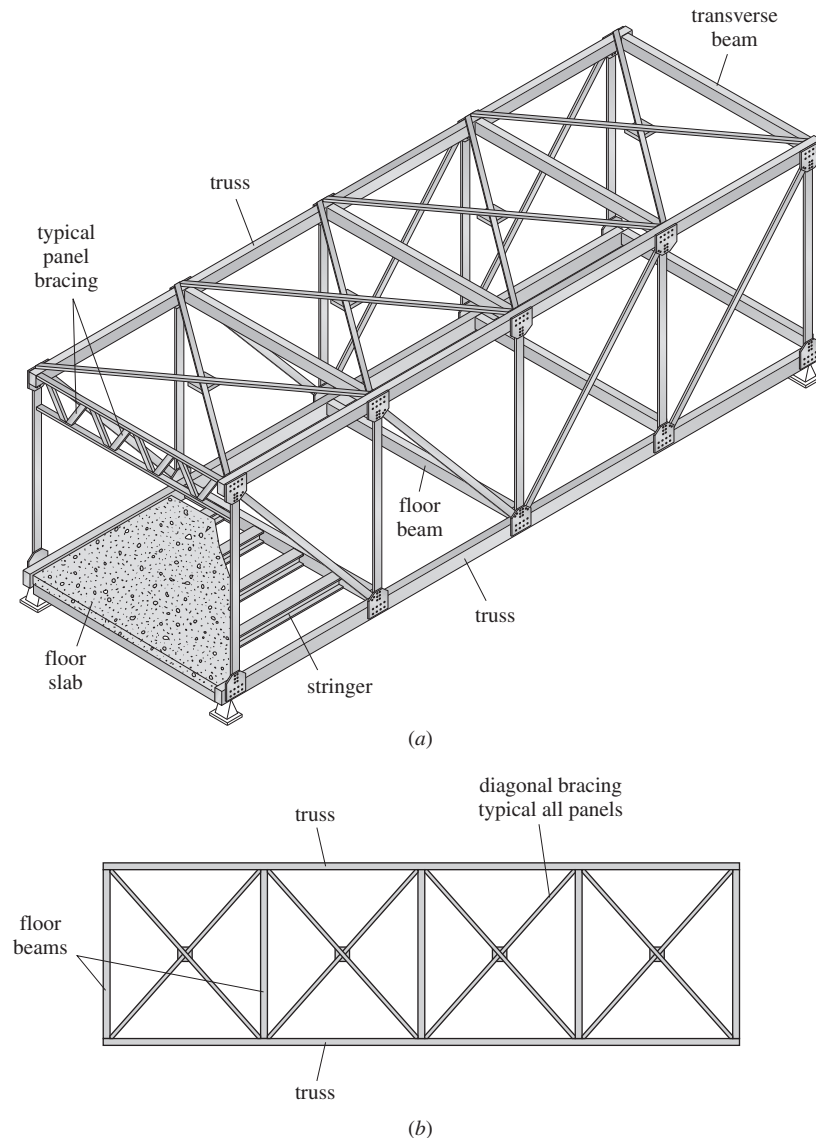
Truss with floor beams and secondary bracing: (a) perspective showing truss interconnected by transverse beams and diagonal bracing; diagonal bracing in bottom plane, omitted for clarity, is shown in (b); (b) bottom view showing floor beams and diagonal bracing. Lighter beams and bracing are also required in the top plane to stiffen trusses laterally.
